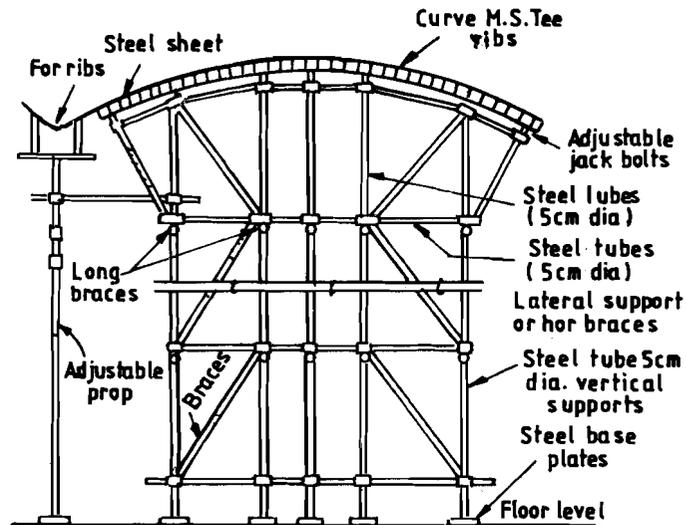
Tubular Steel Formwork for Barrel Shell-roofs
